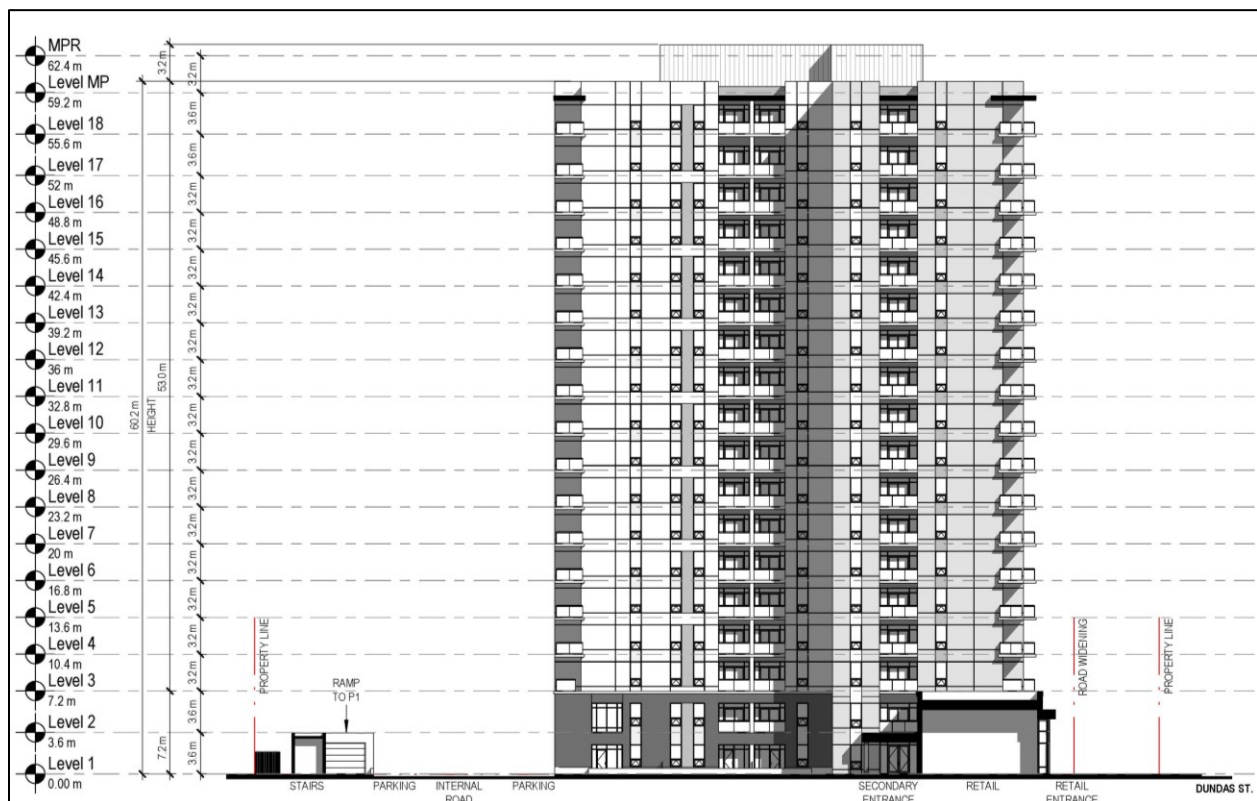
Proposed East Side Elevation (Interior side yard, facing a commercial lot)
